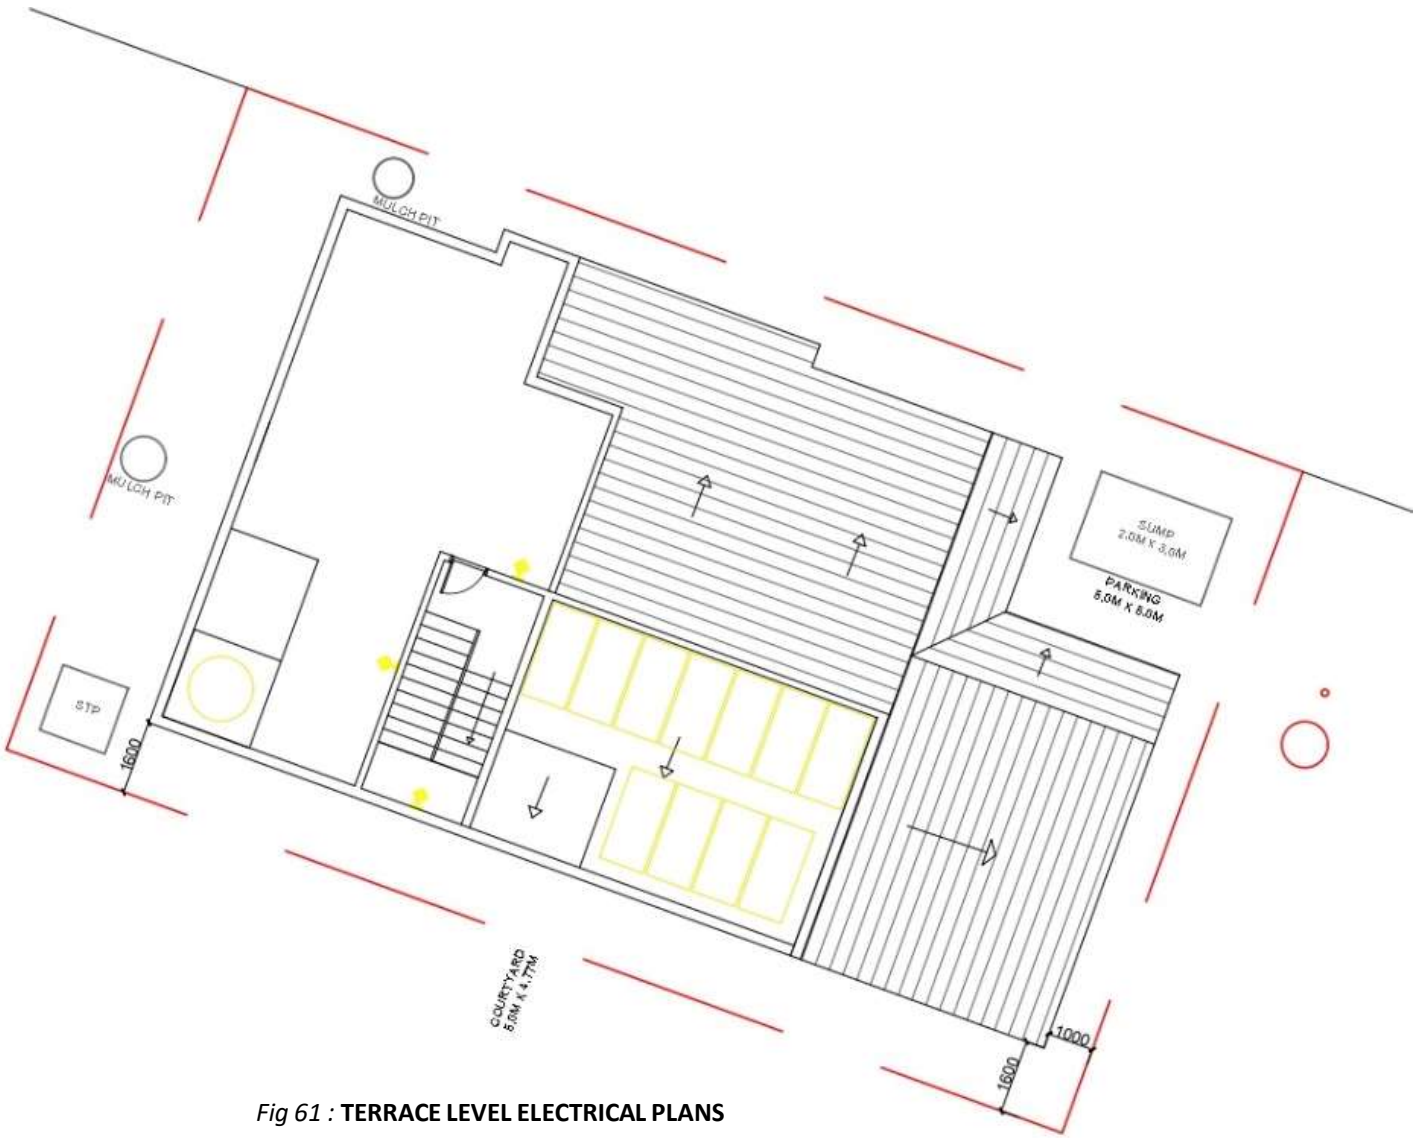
TERRACE LEVEL ELECTRICAL PLANS
